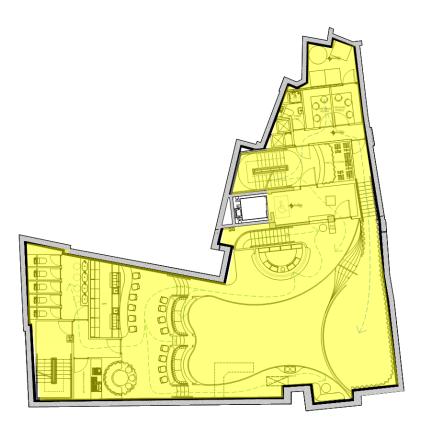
Plan showing the current proposed basement layout of Madame Jojo's
